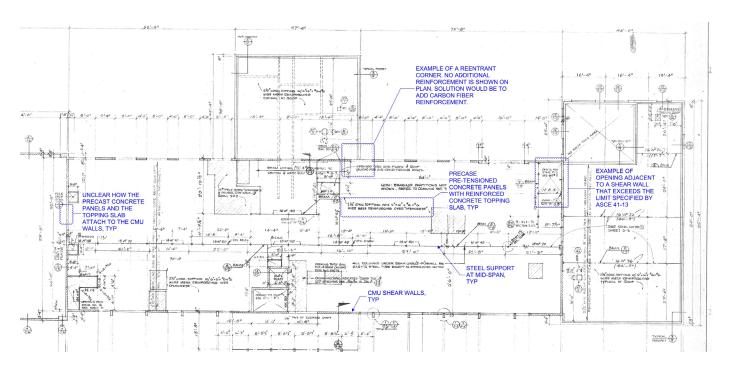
Main Police Building Second Floor Framing Plan indicating non-compliant items
